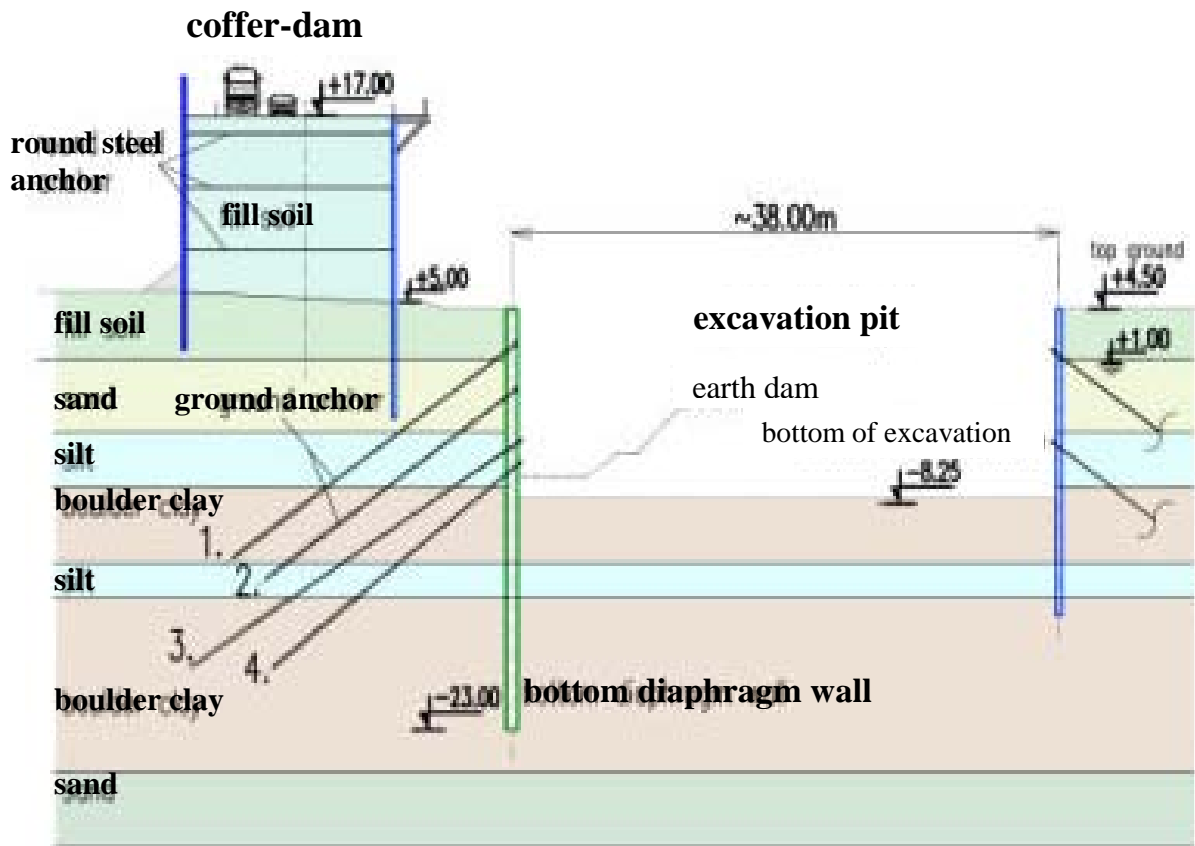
1 Cross section of the excavation pit [Raithel, M. et al, 2005]
